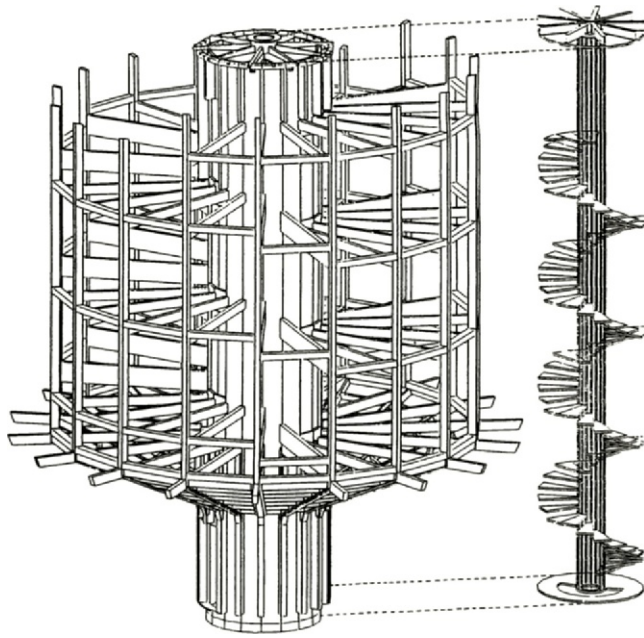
A section of the rotating solar house called the Heliotrope. (Courtesy of architect Rolf Disch.)
